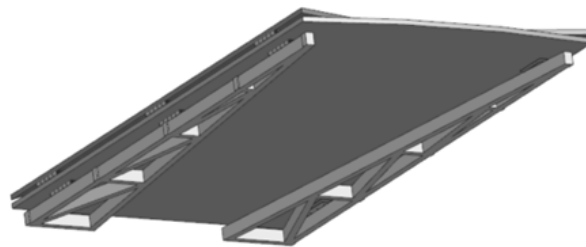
Position of truss before deployment. The trusses lay flush against the floor panel to reduce size of uninflated structure. (Created by Mason Hoene)
